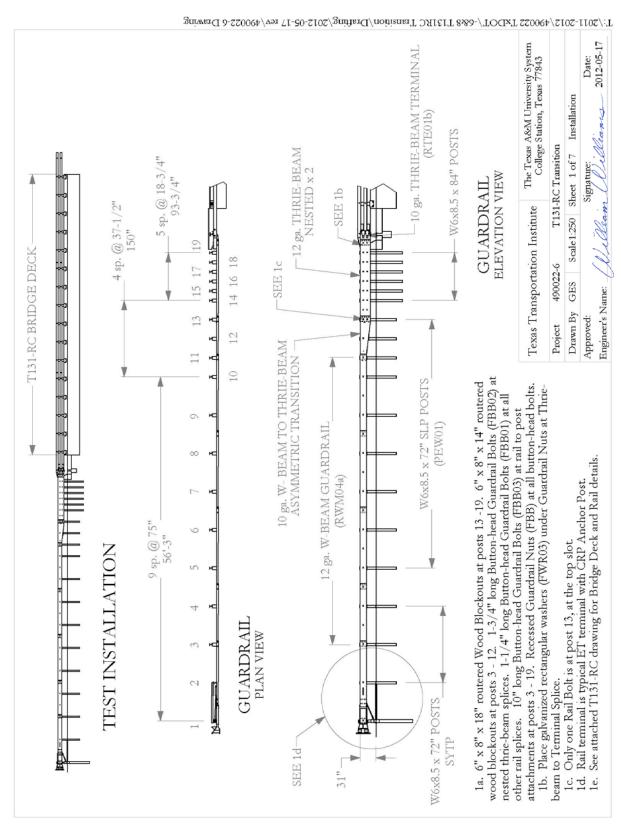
Details of the TxDOT T131RC Bridge Rail Transition Installation.
